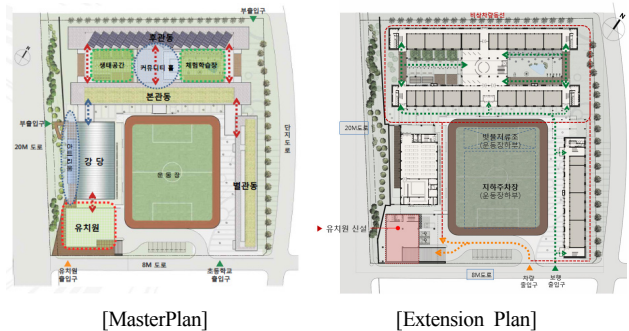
J School Green Remodeling Master Plan & Extension Plan
